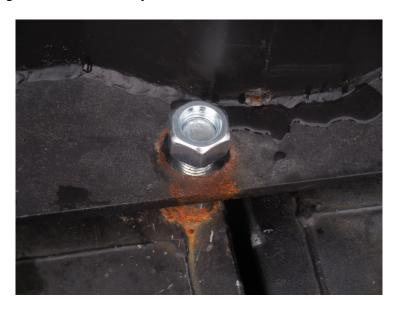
"Typical Parapet Detail" was used as reference. It was observed that all connections were bolted rather than welded. The following is noted:
